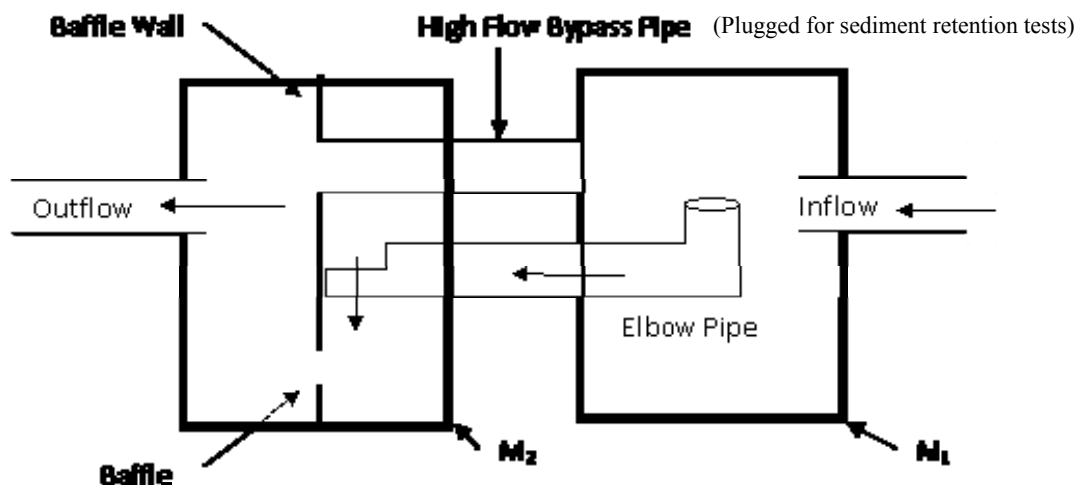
Environment 21 V2B1 laboratory testing – device drawing
